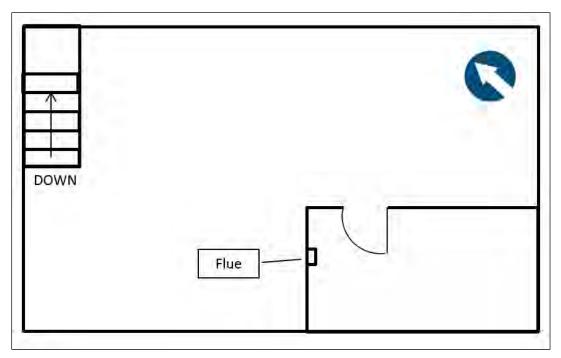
SECOND STORY PLAN (NOT TO SCALE)
